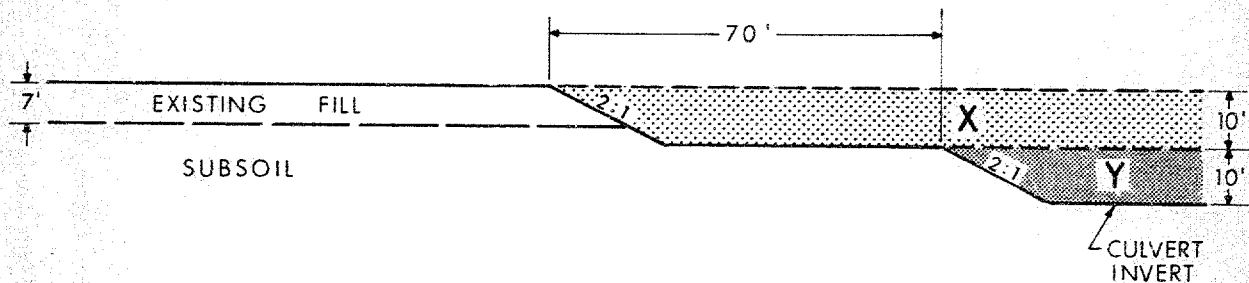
B - TEMPORARY BENCHING REQUIRED IN EXCAVATING FOR CULVERT
